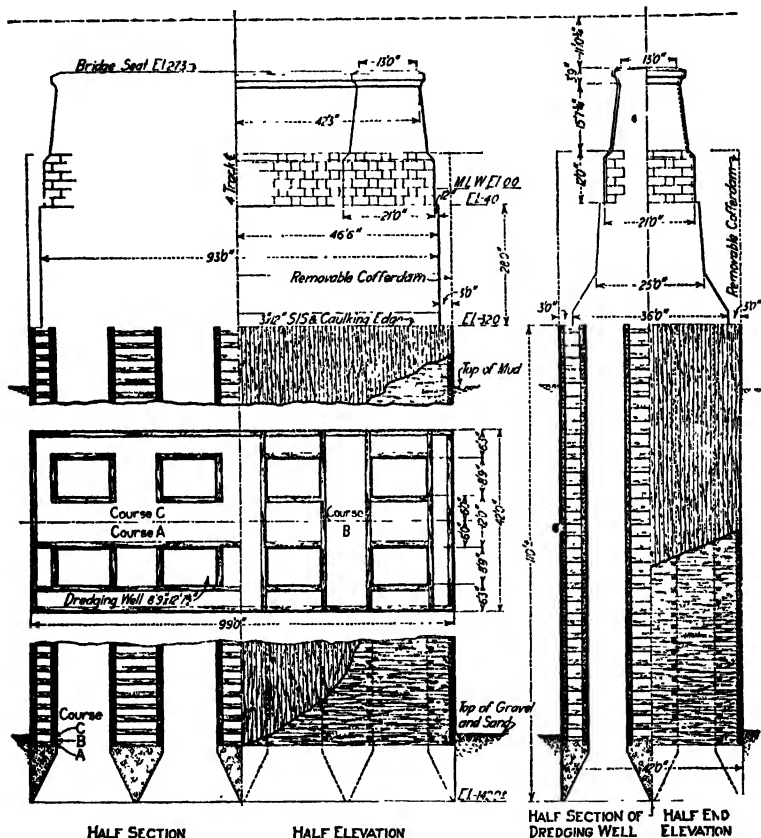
Timber Open Caisson with Dredging Wells of New Thames River Bridge at New London, Conn.
